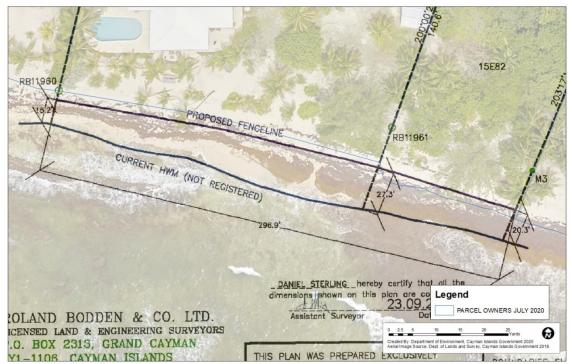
LIS 2018 Aerial image overlaid with site plan (Source: Roland and Bodden 23 Sept 2020)
